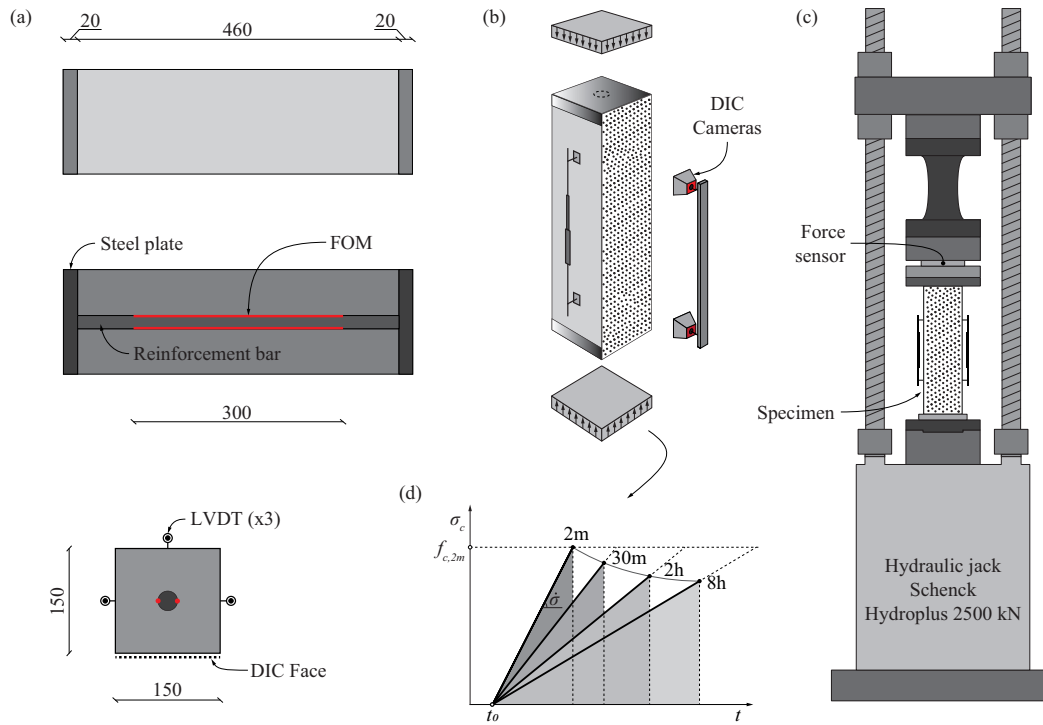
Test setup: (a) view and sections of the specimen; (b) 3D view of the specimen and of the performed measurements; (c) test setup; (d) applied loading patterns
